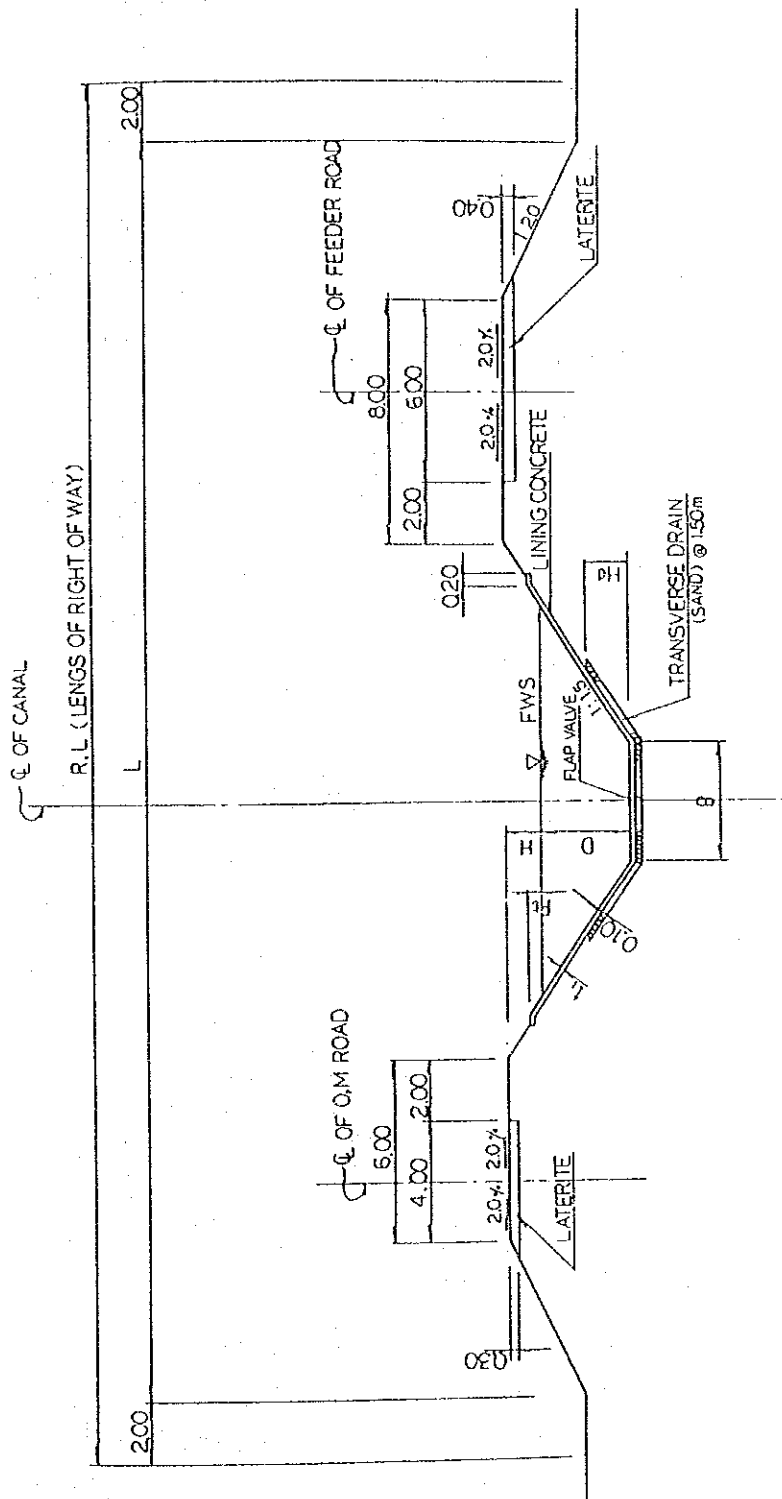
STANDARD CANAL CROSS SECTION
